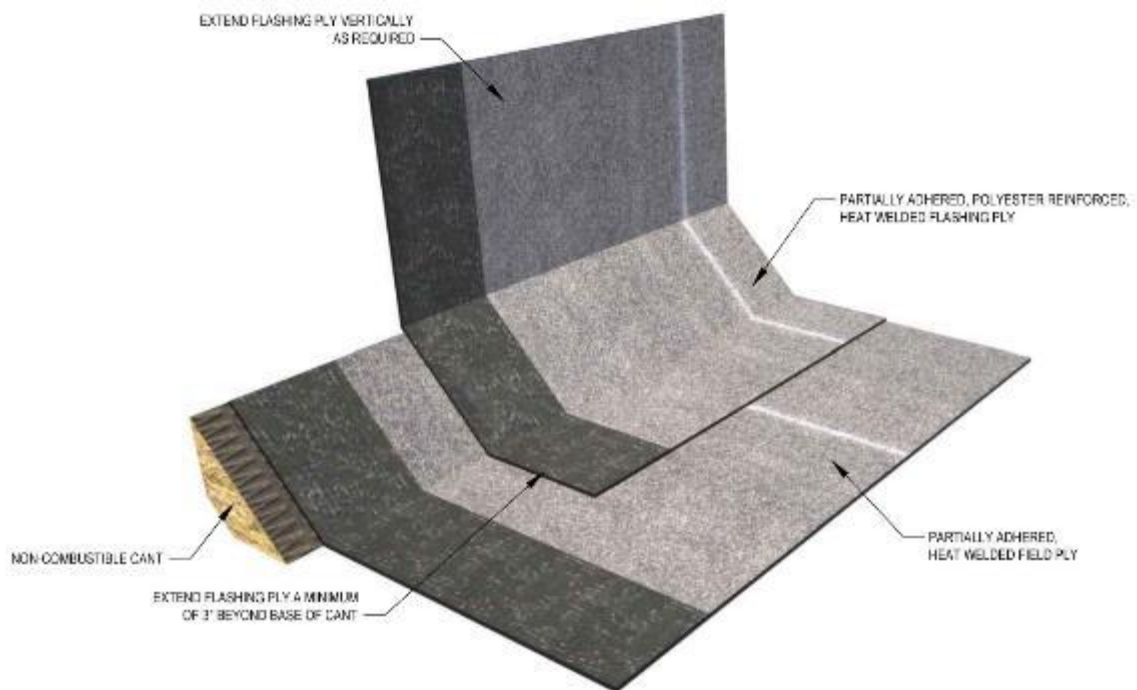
Partially Adhered, Heat Welded Vapor Retarder Flashing at Wall/Curb Flashing With Cant
